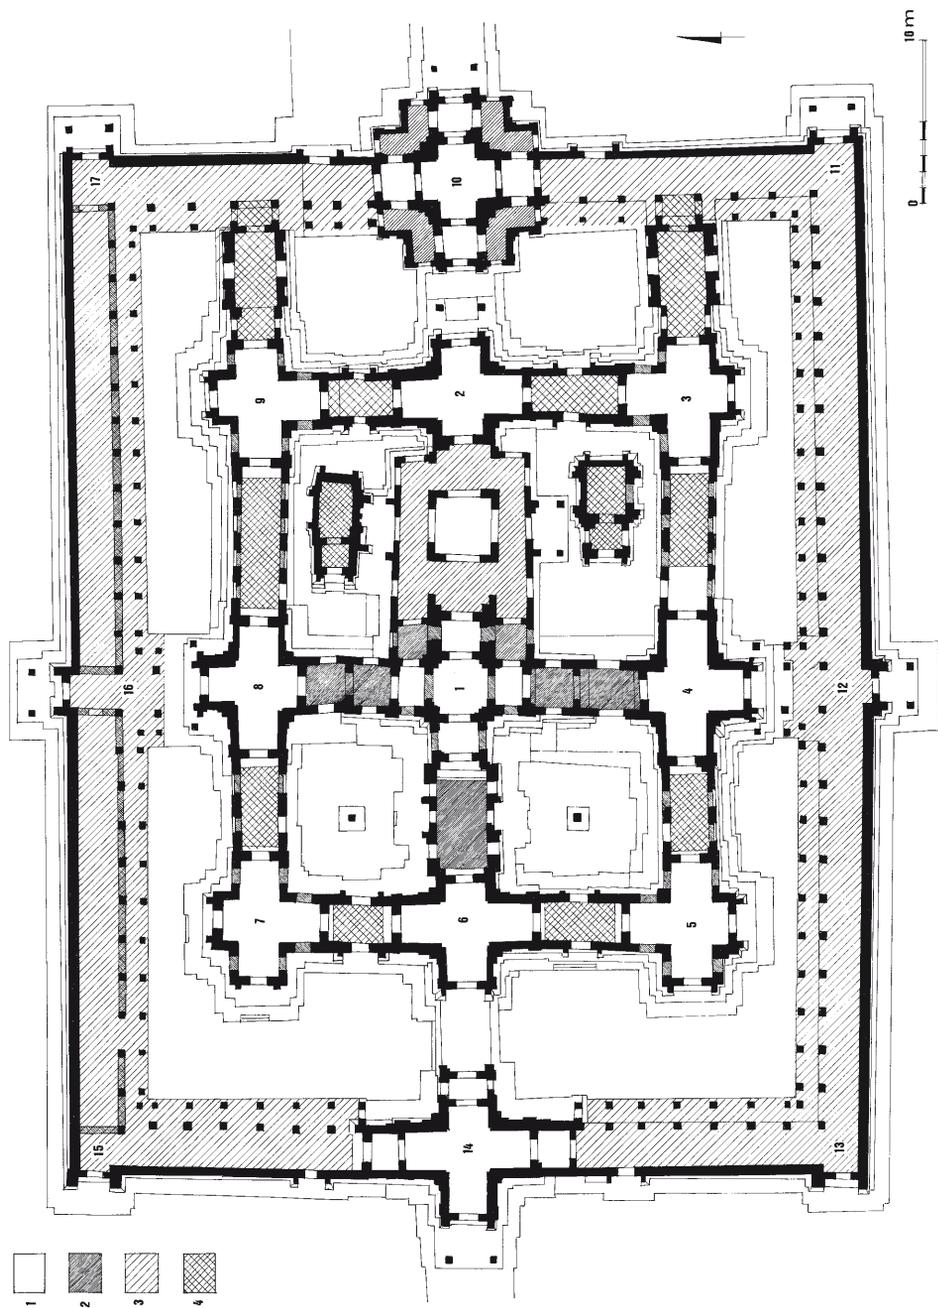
Bantay Kdei, Cambodia, plan of different construction steps of the temple.
